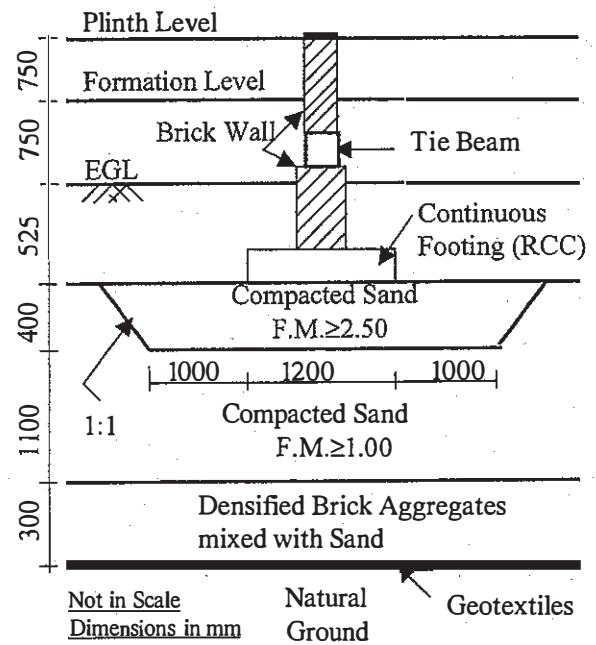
Typical cross of the foundation system used at 75 square meter staff quarter.
